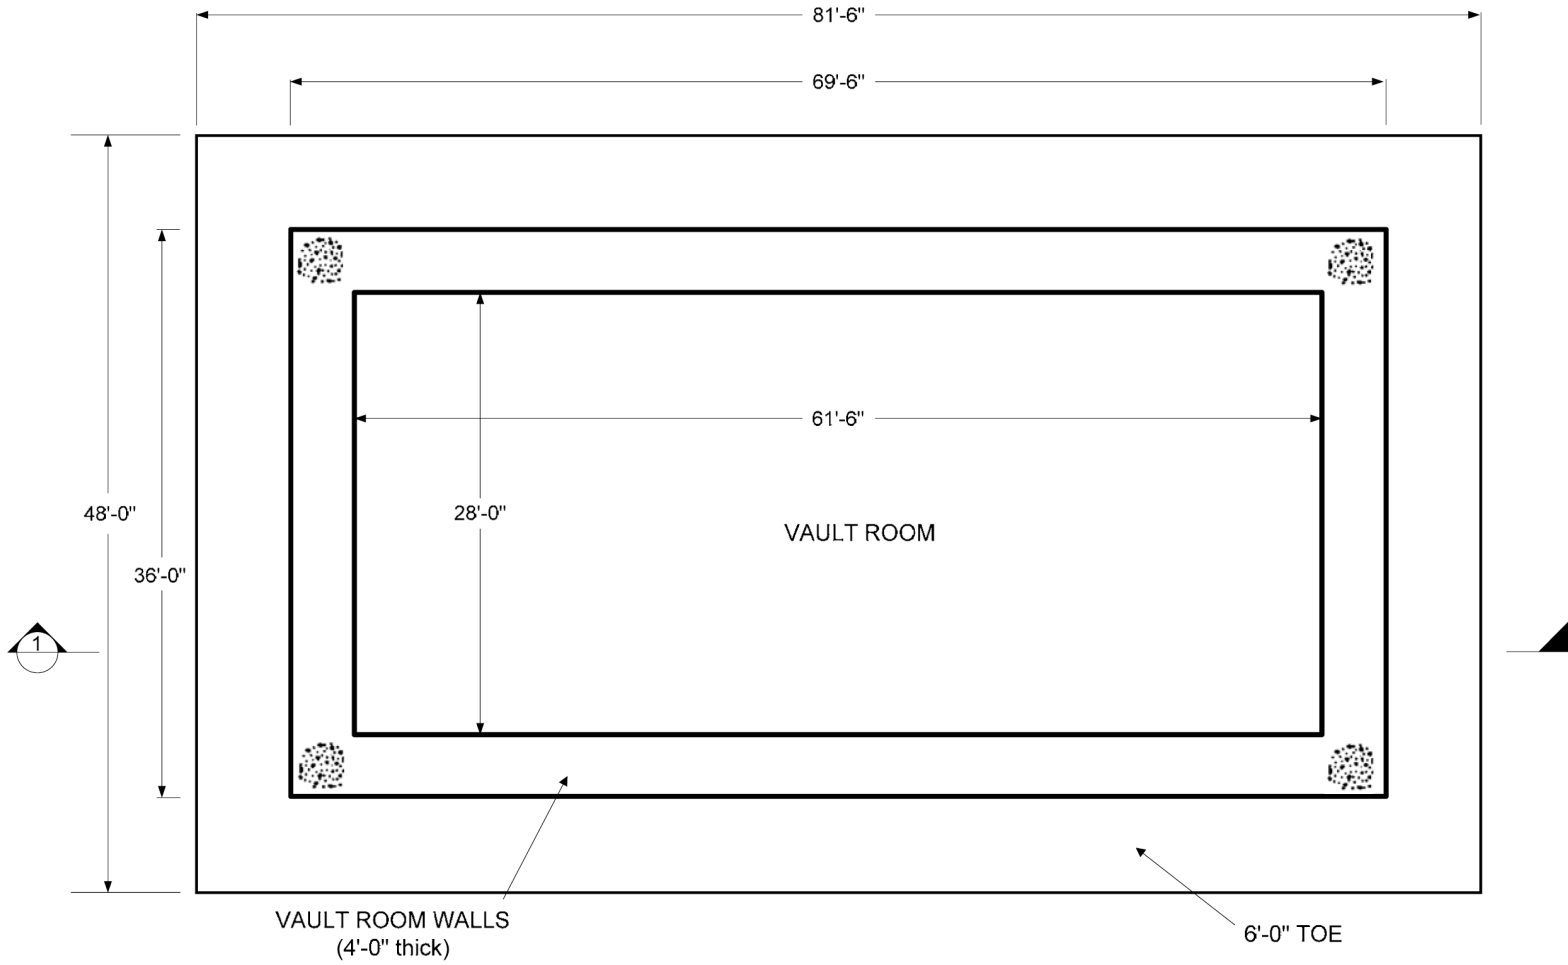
H.6-250 Plan View of DGFO SV at Elevation -3'-0"
